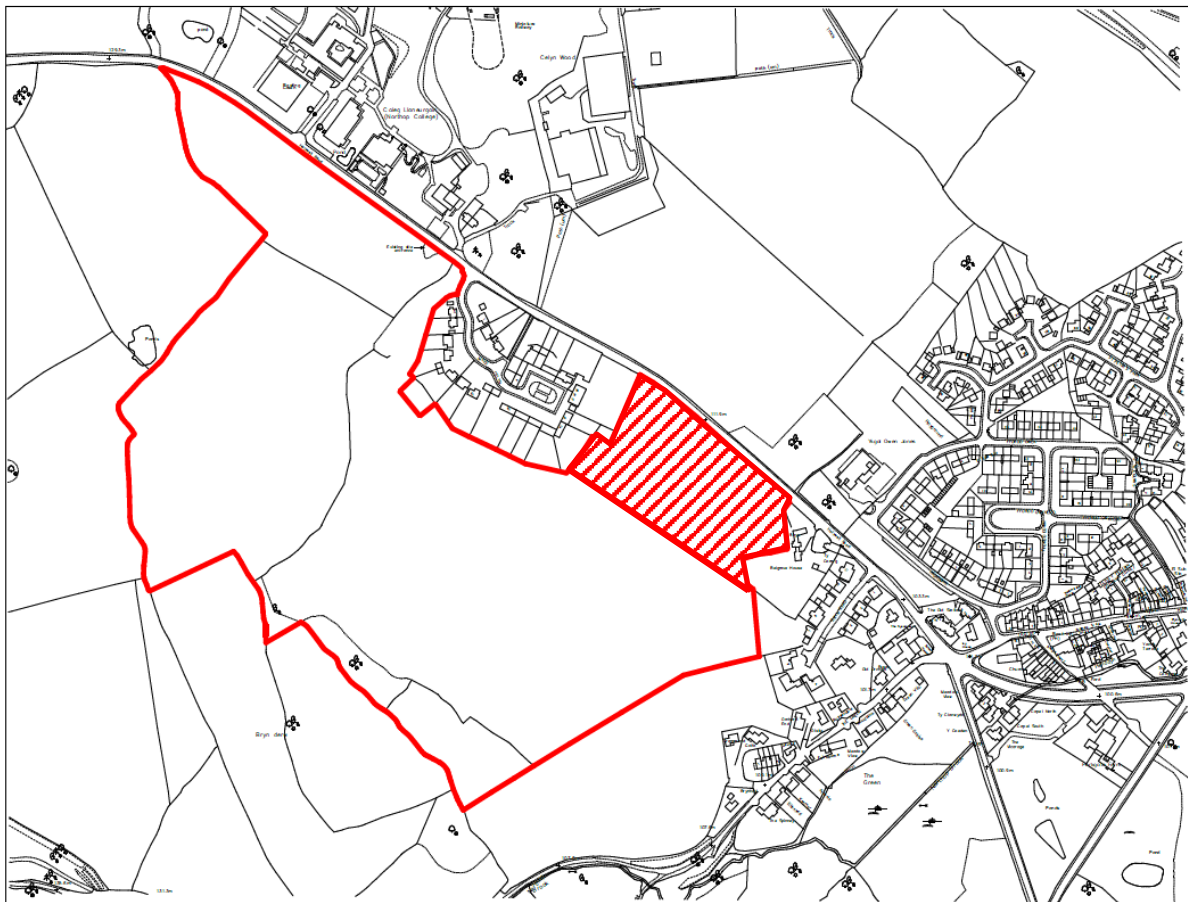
Site location plan - Land adjacent to Maes Celyn, Holywell Road, Northop
